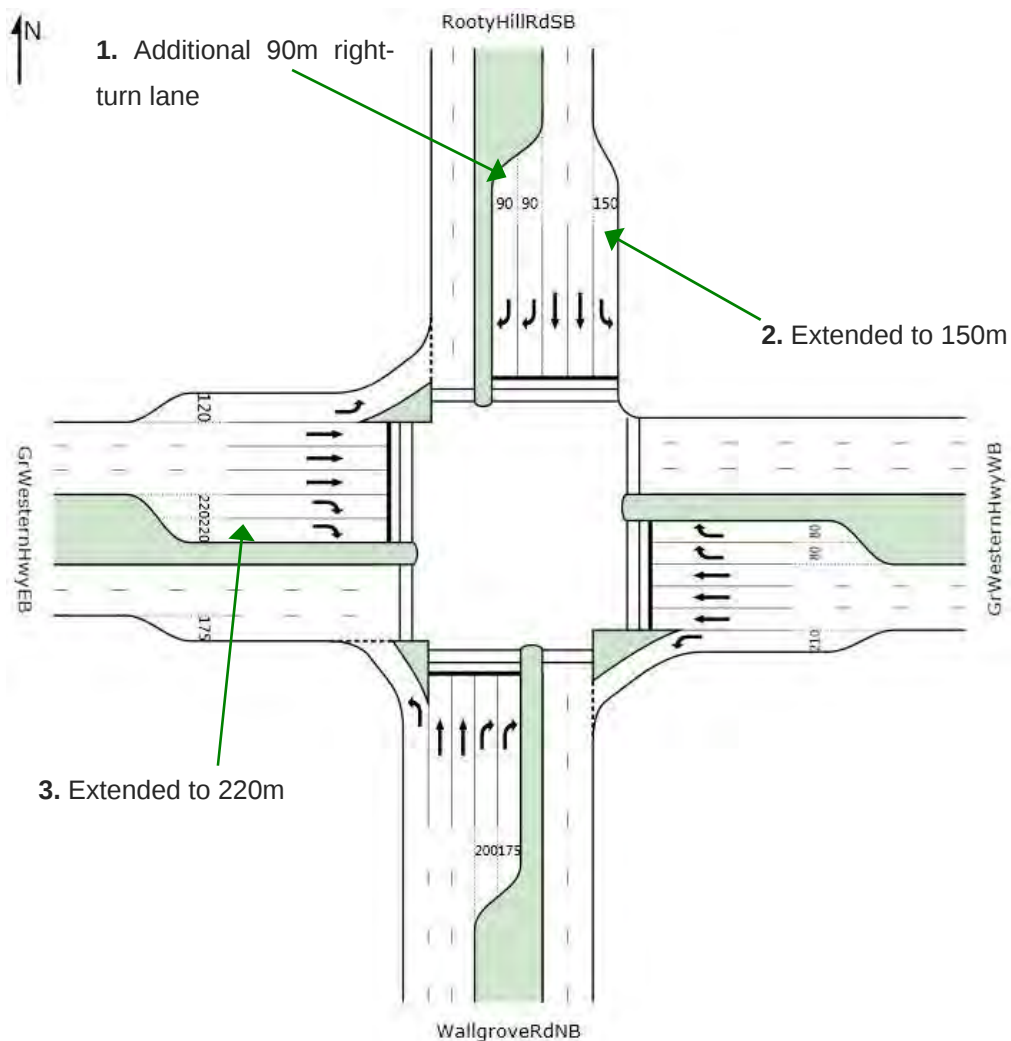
Proposed Signalised Intersection of Rooty Hill Road South with Great Western Highway
